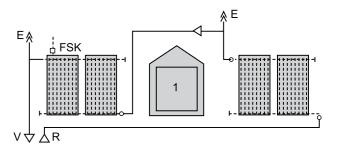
Hydraulic connection of collector arrays that are split by a roof
